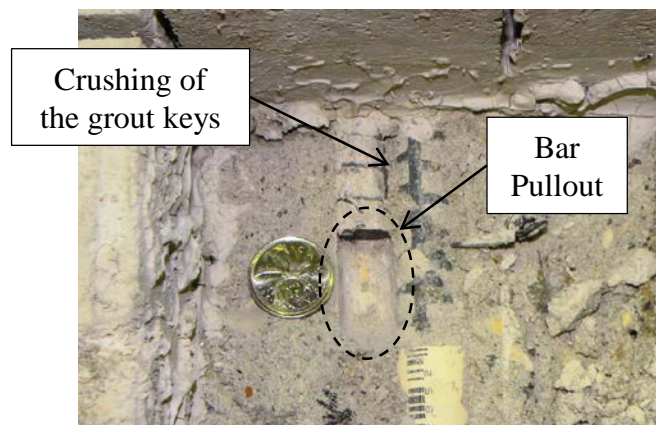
Typical internal damage observed in the specimens that failed by bar pullout only or by bar pullout followed by longitudinal splitting – Specimen P250-1.
